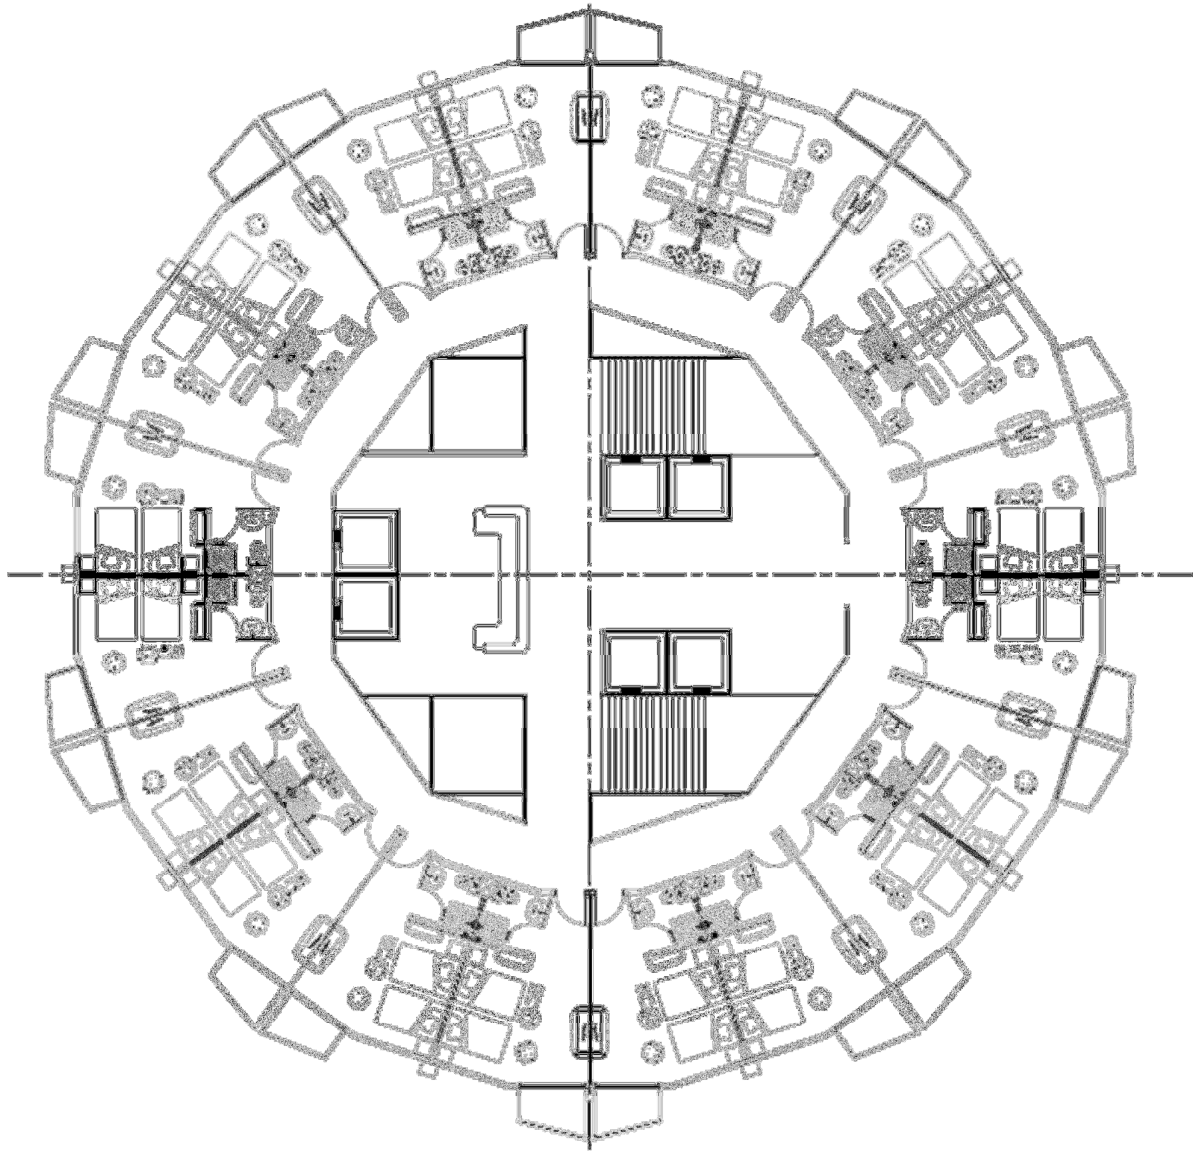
Typical Floor for Guest Rooms (starting from 1st floor up to 14th Floor) (Item c)
